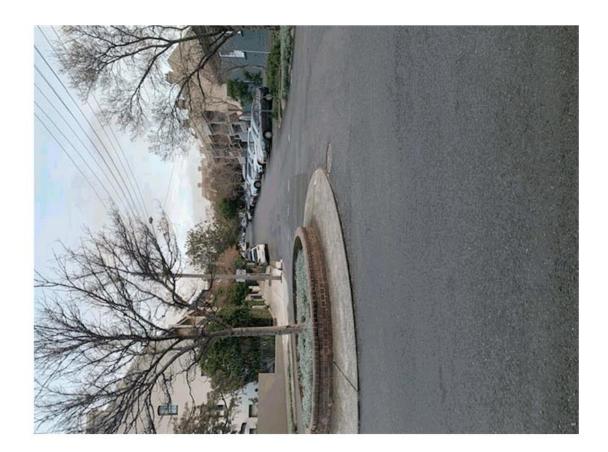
below. View towards Goodhope st from Vialoux Ave, Note extensive fall and grade.
